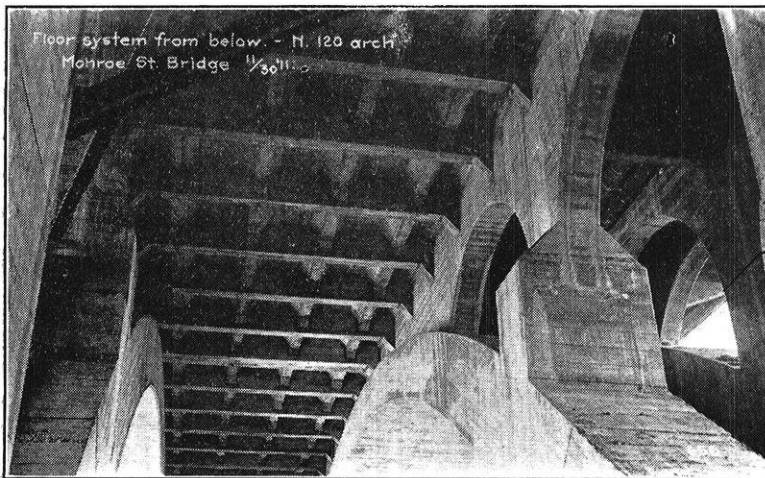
View Underneath 120 Foot Arch. (Style of Floor Construction Was Practically the Same for 281 Foot Arch.)
